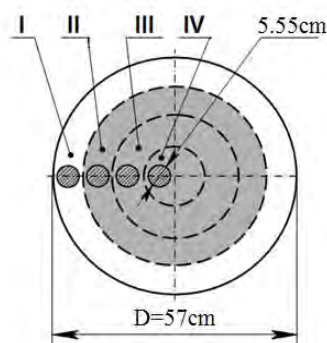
The zones of the cross-section of massive cylinder made of lipoie pumice concrete from which test samples had been drilled.
